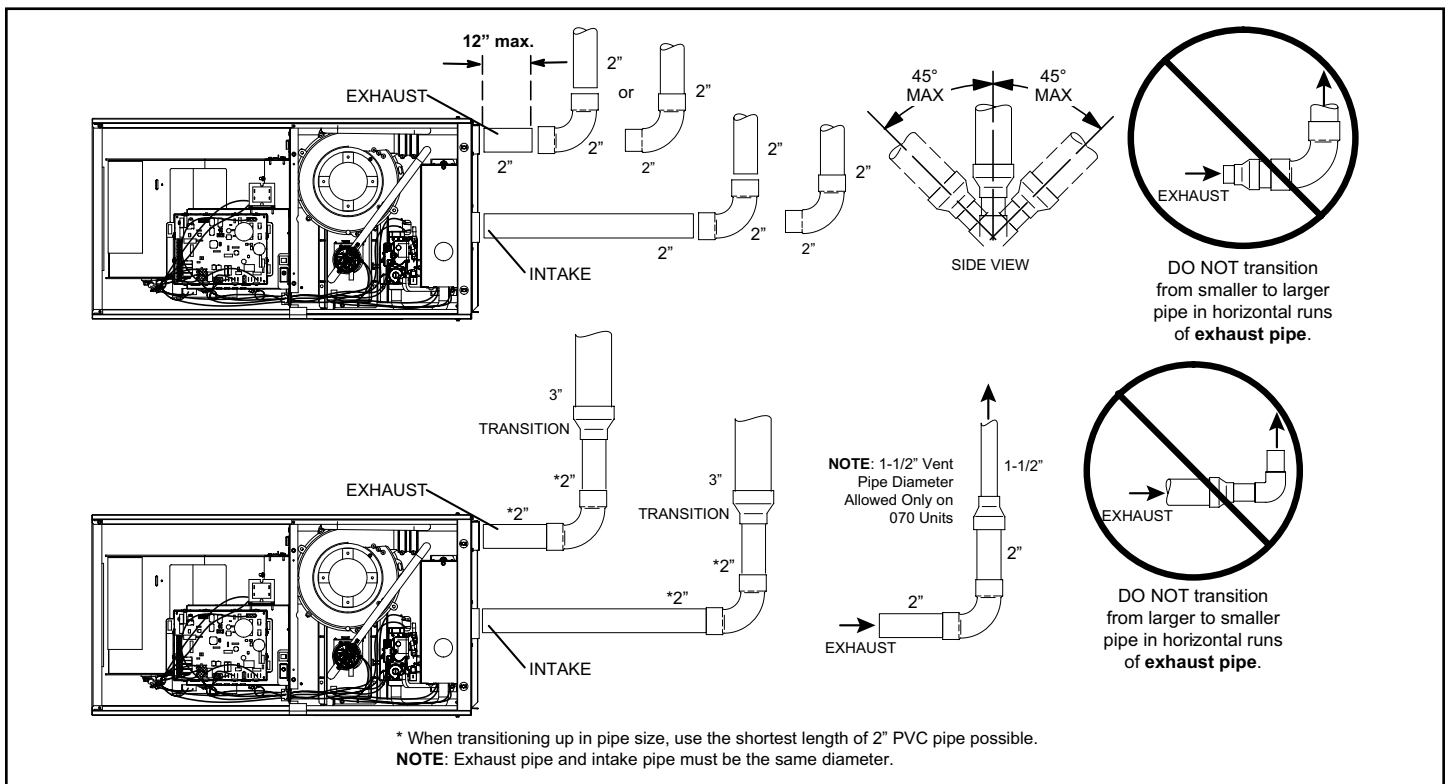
Typical Exhaust and Intake Pipe Connections and Condensate Trap Installation in Horizontal Air Applications (Right Hand Discharge Shown)
